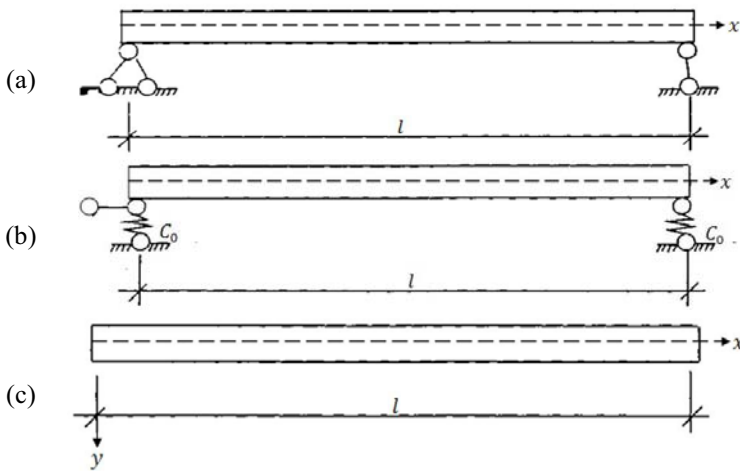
Design of beams with different pillars at the ends: (a) beam with swinging pillars;(b) beam with elastic pillars;(c) beam with no pillars (hanging)
